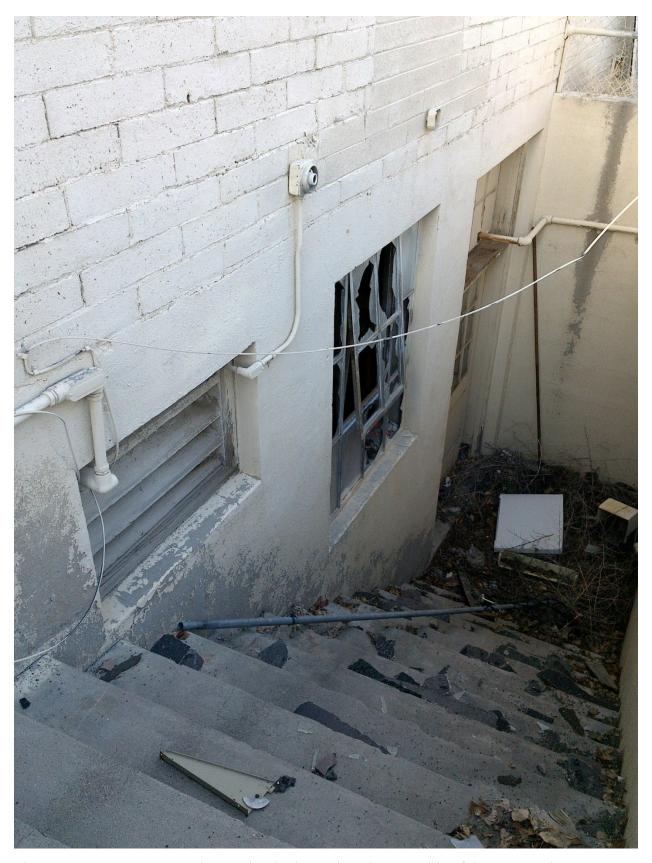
Basement access door and stairs located on the west side of the courtyard.
